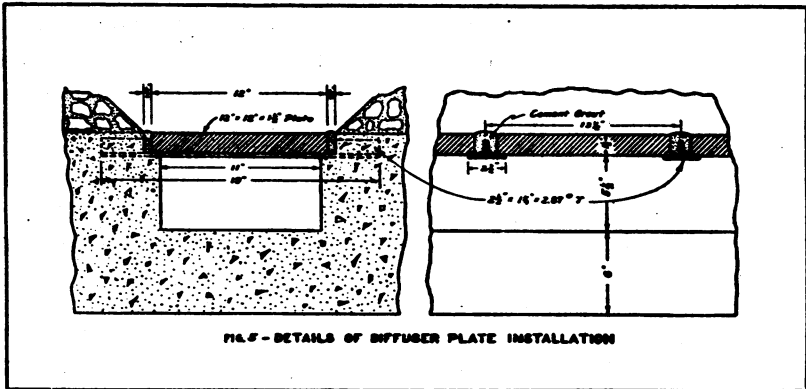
DETAILS OF DIFFUSER PLATE INSTALLATION
